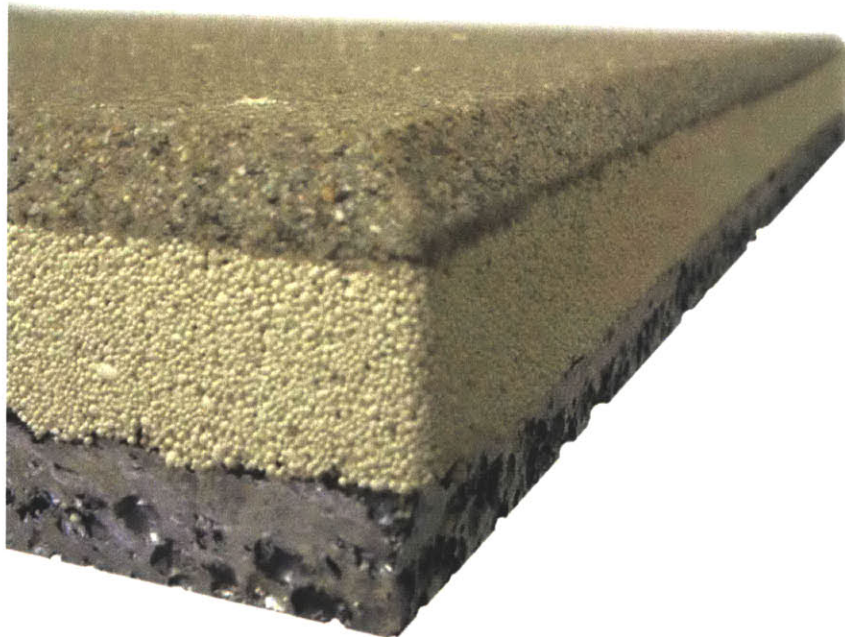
Cross-section of Aigis blast resistant wall product (Source: Aigis Blast Protection)
